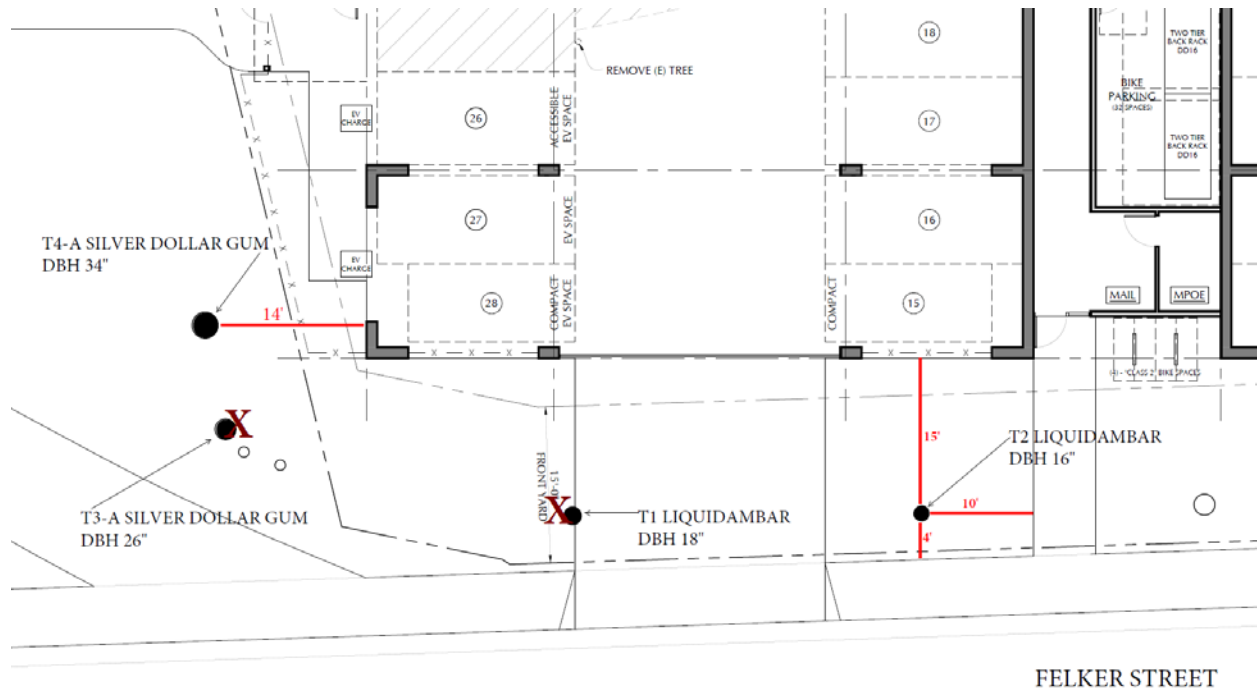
Tree T4-A, silver dollar gum, distance to new building.
